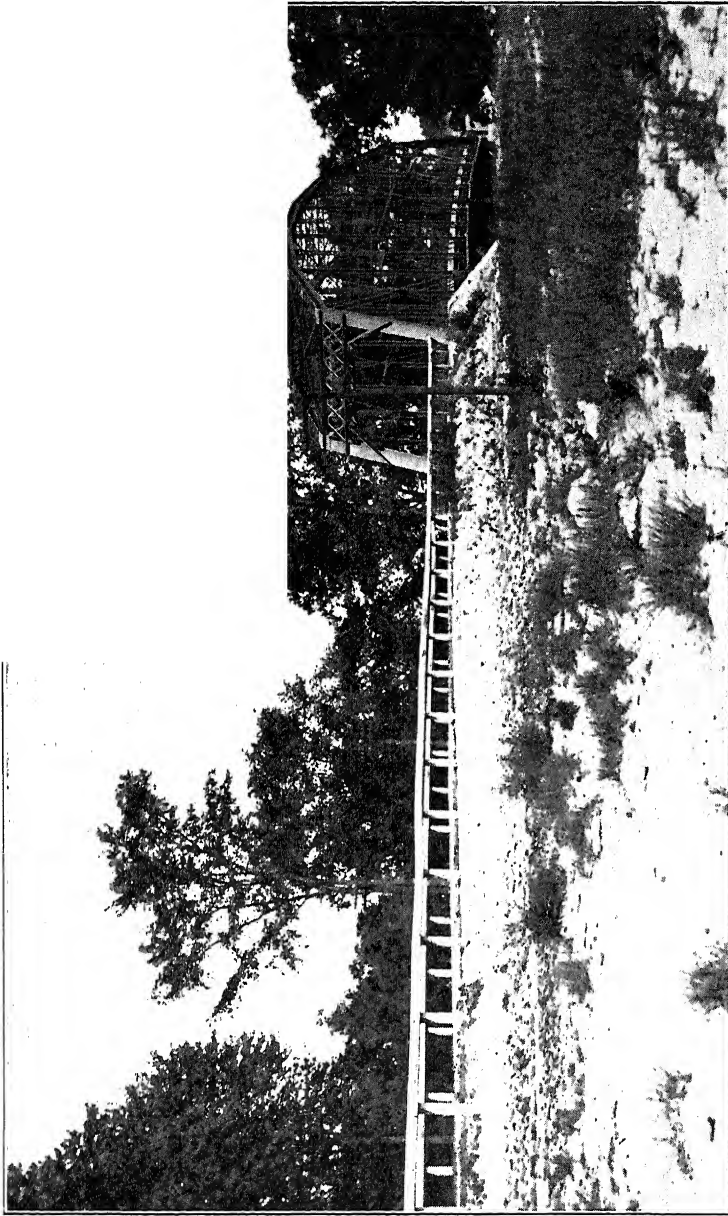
Modern solid floor highway bridge. Well designed approach protected with substantial concrete guard rail (Monroe Co., New York). Span 230 ft. roadway 19 ft. wide. Designed for a live load of 150 lbs. per sq. ft. plus a 20-ton traction engine. Approximate cost (1920) \$30,000. Actual cost (1912) \$22,000.
